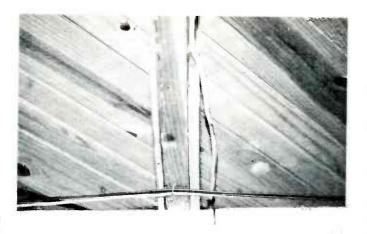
Bent nail is used in place of a UHF standoffanother example of poor installation practice.
